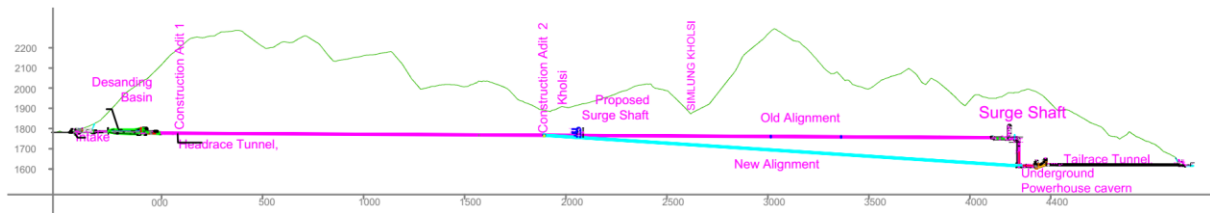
Alternative layout of Rasuwagadhi HEP
